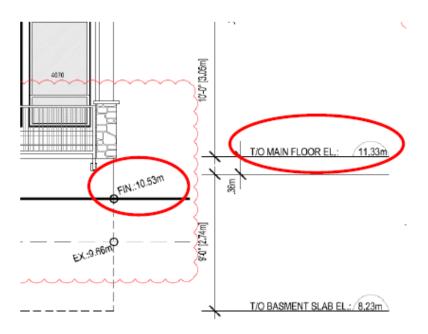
August 31, 2023 elevation plan showing first floor and finished grade elevations
